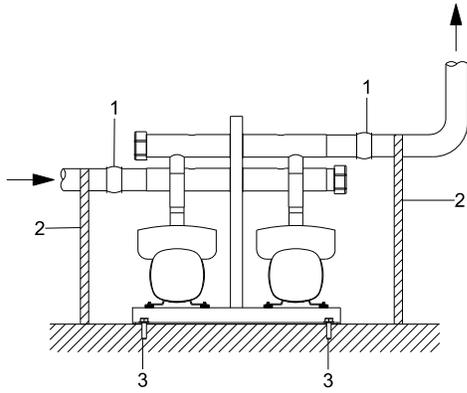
Example showing the position of expansion joints, pipe supports and machine shoes
